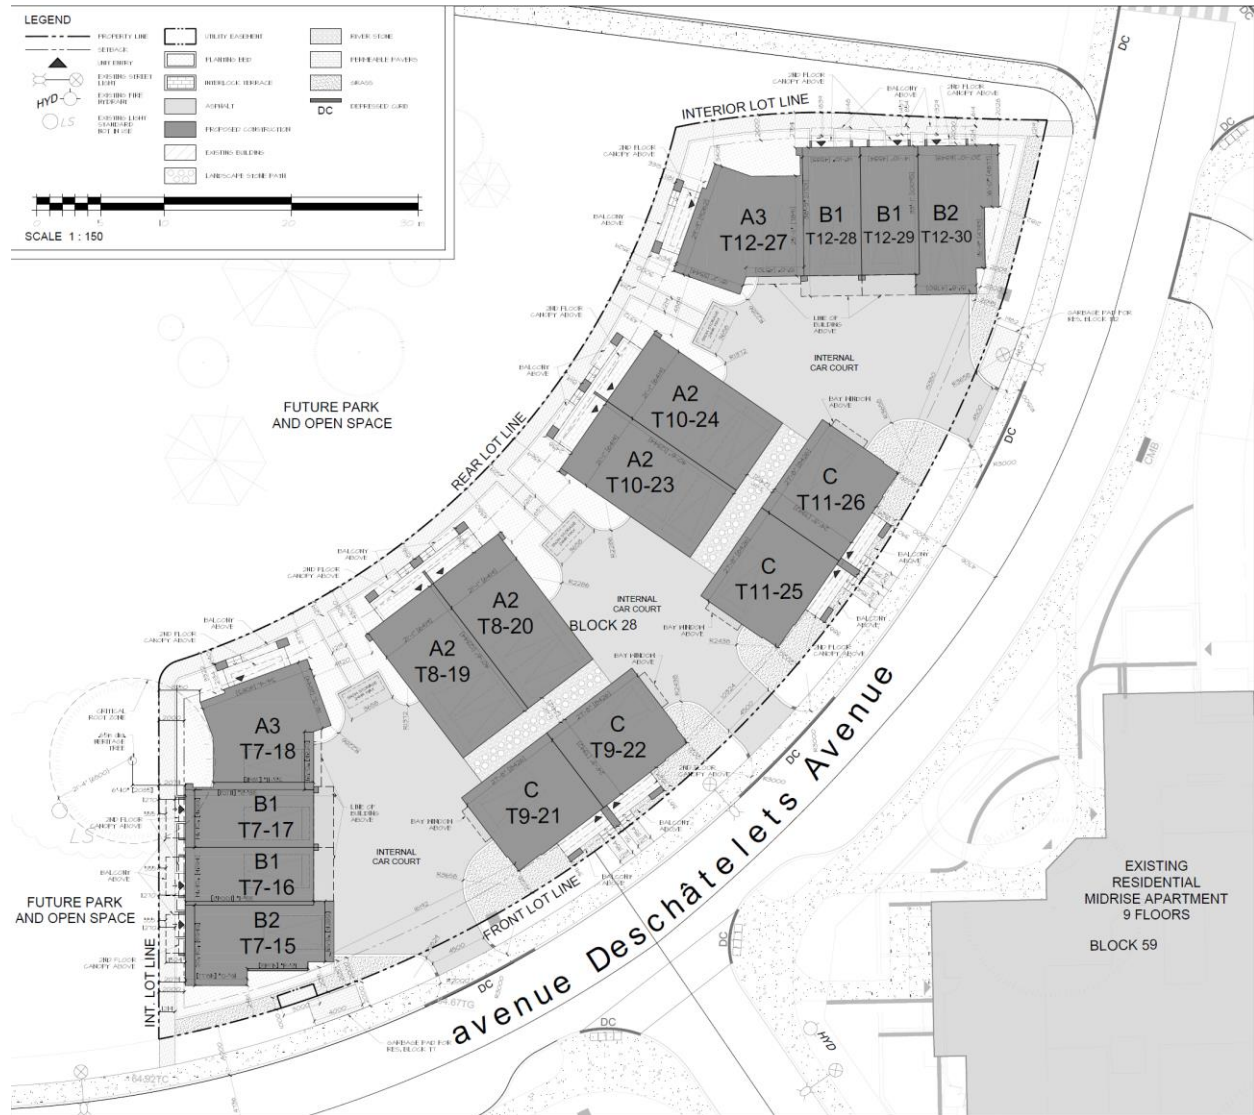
& 5: Site/Block plan of the proposed townhomes. Source Hobin Architecture August 1 2024.
